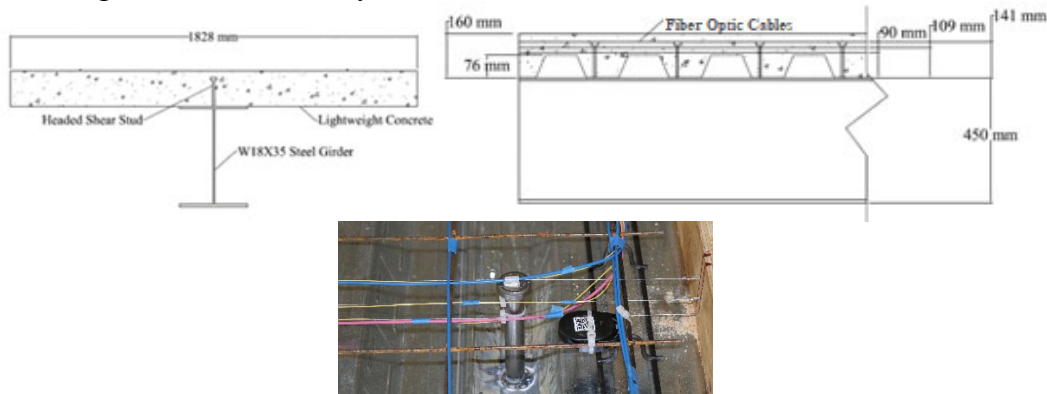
Transverse and longitudinal cross sections and instrumentation scheme of the composite beam.
